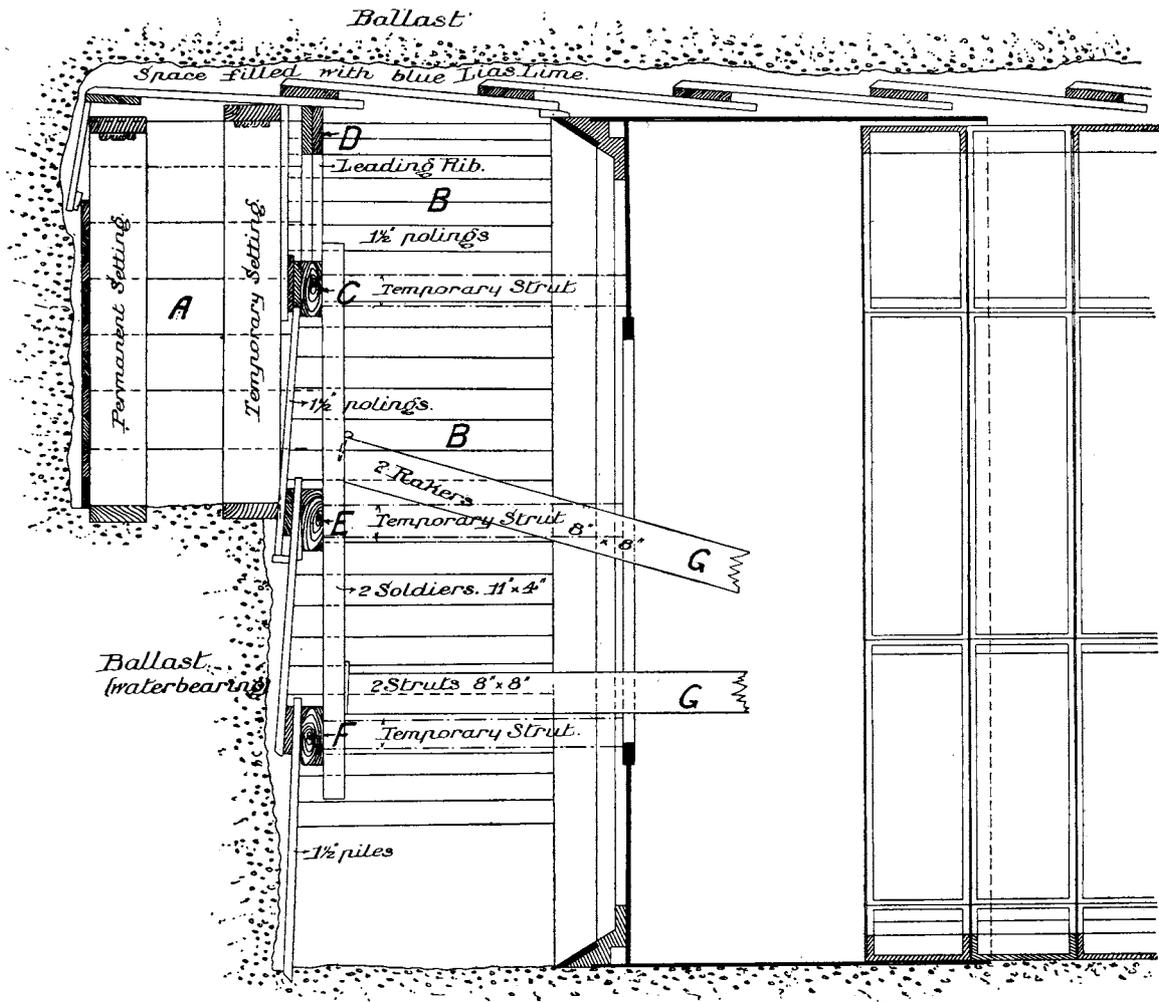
THE WATERLOO AND CITY RAILWAY, LONDON.
